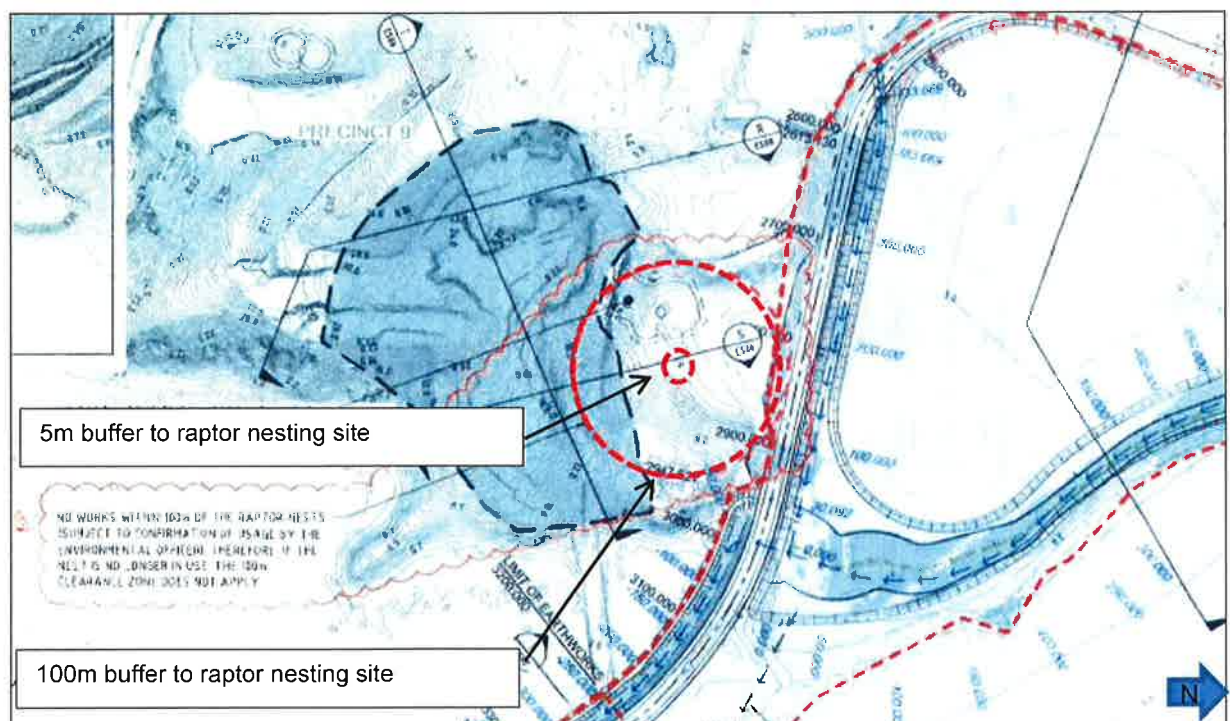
Extract from Approved Bulk Earthworks Plan – Precincts 9 and 11
